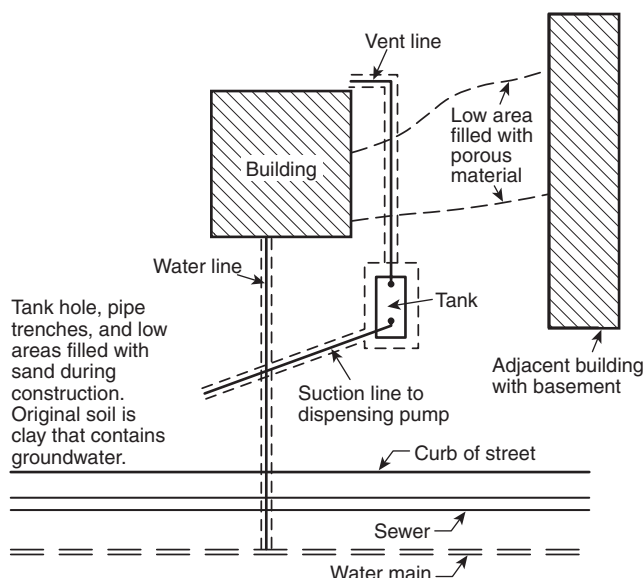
(b) Tank Installed Next to a Building with a Basement.
